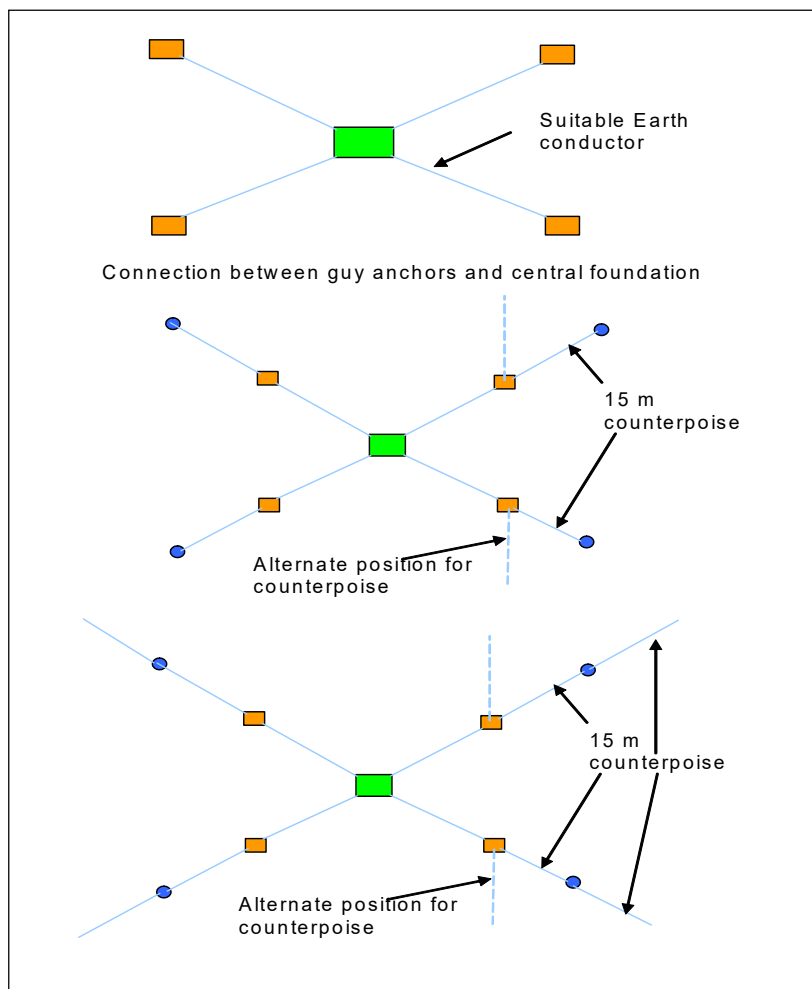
Additional Earthing for Guyed “V” and Cross Rope Suspension Towers
